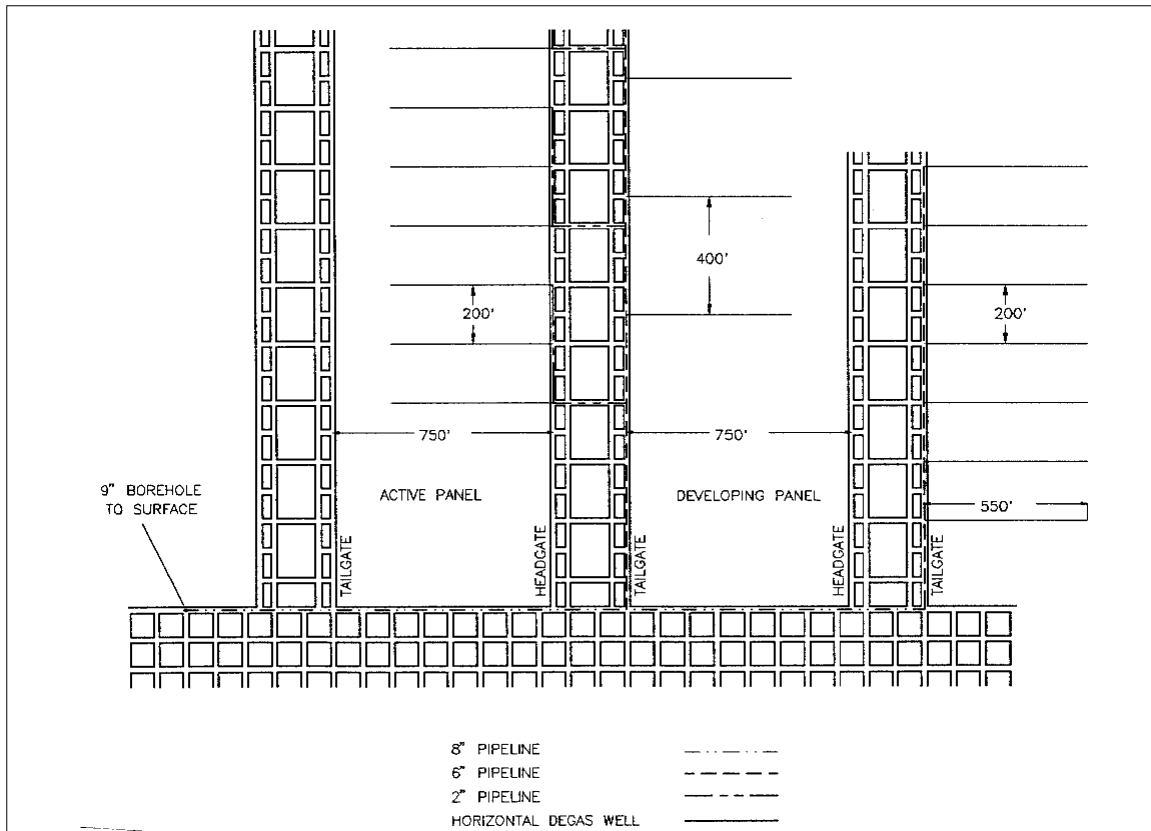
Typical horizontal borehole pattern and pipeline arrangement at a longwall mine (Aul and Ray, 1991).
